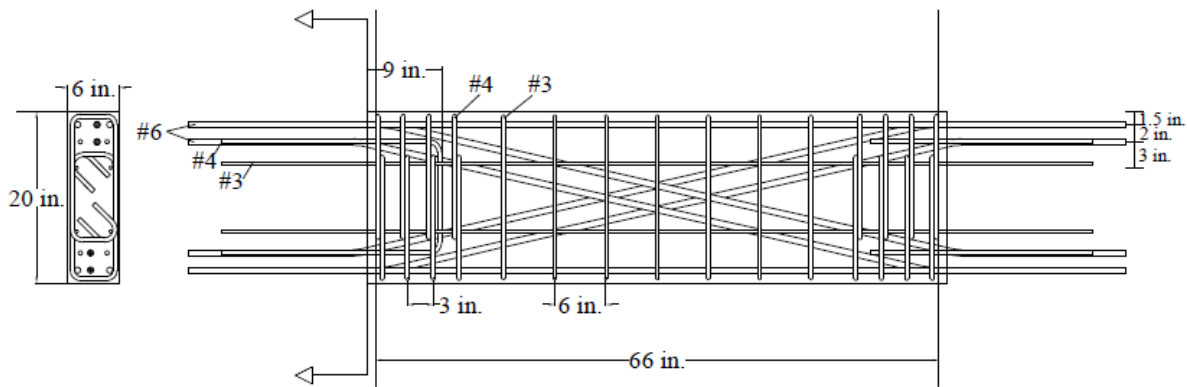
Reinforcement detailing for CB-4 (adapted from Setkit, 2012)
